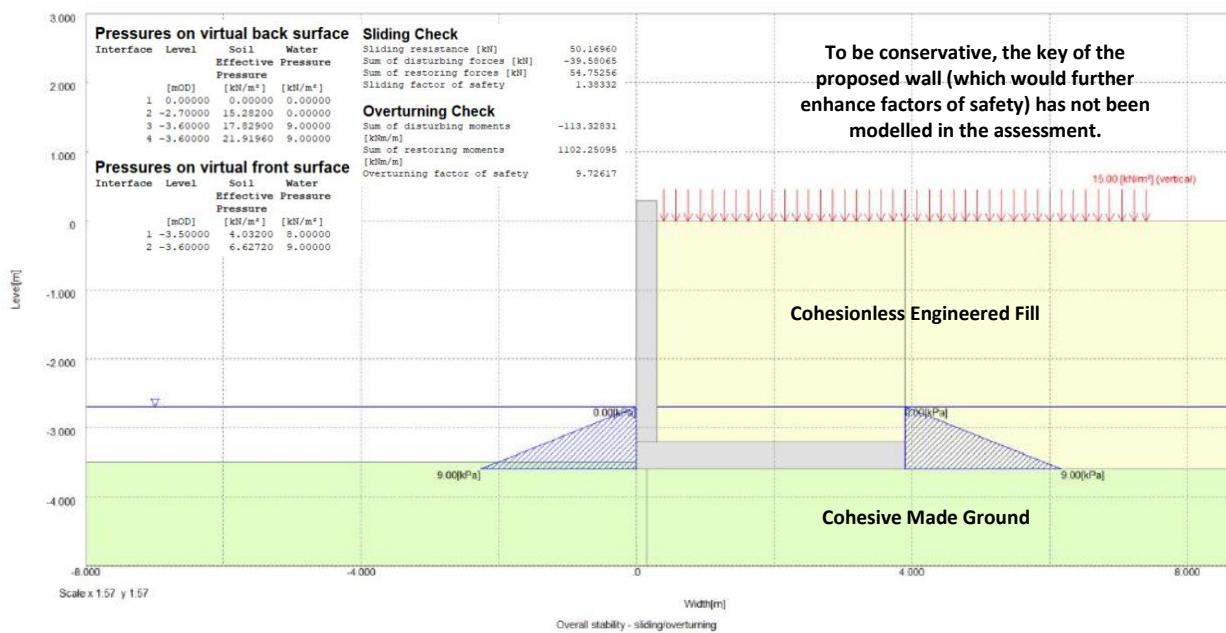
Proposed Wall – Backfill 2 (GRETA ULS Output)
